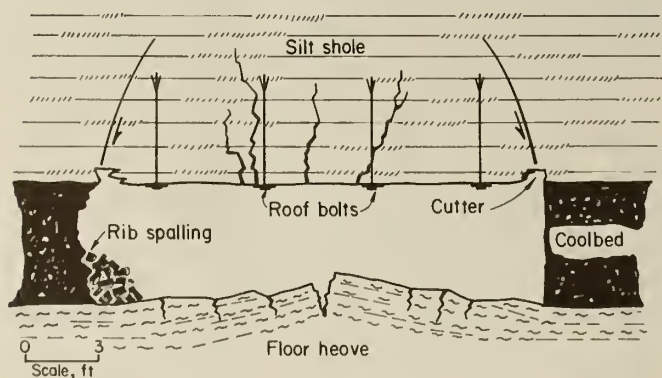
Subtype S_2 roof failure attributed to mining-induced stress.
